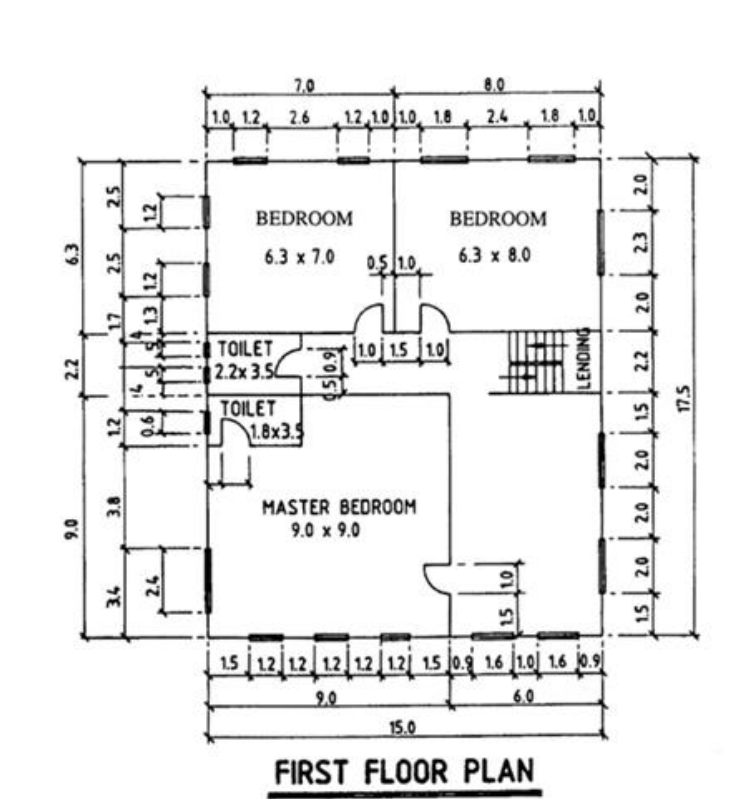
Typical house first floor plan (Ahmad 2004).
